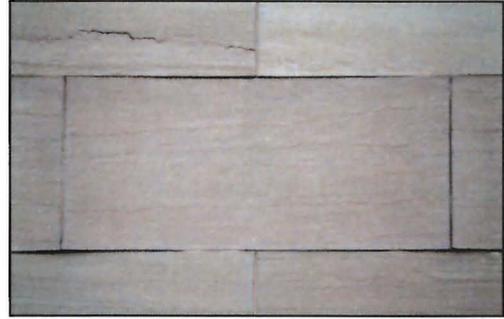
Detail of a *Tennessee marble* panel (1.5 m wide) on the west façade of the National Air and Space Museum. Convex warping away from anchors creates shadows below vertical joints.
